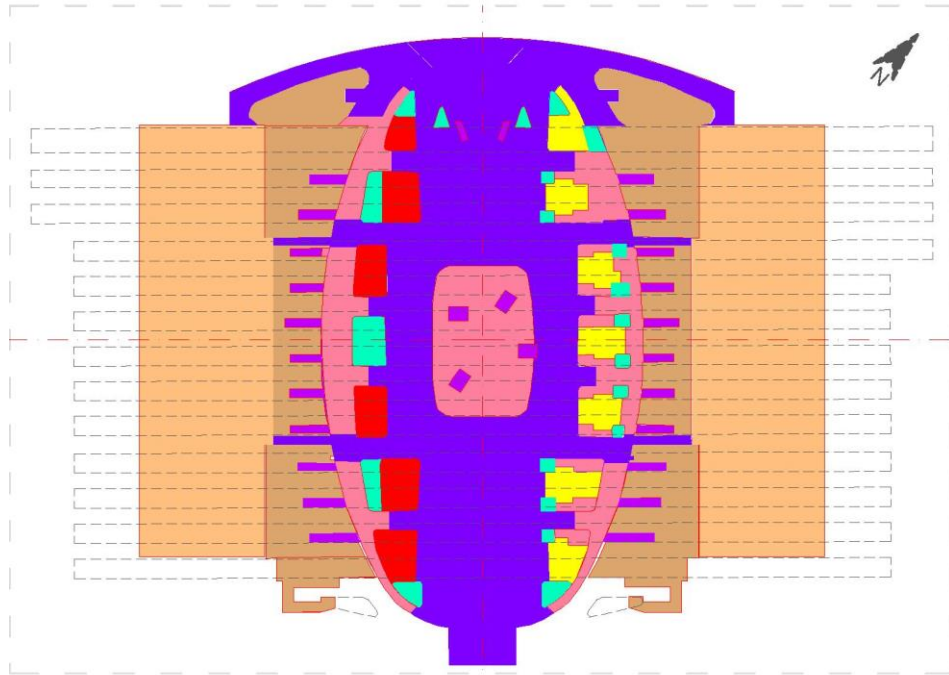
Floor Plans of Berlin station showing spatial configurations;
